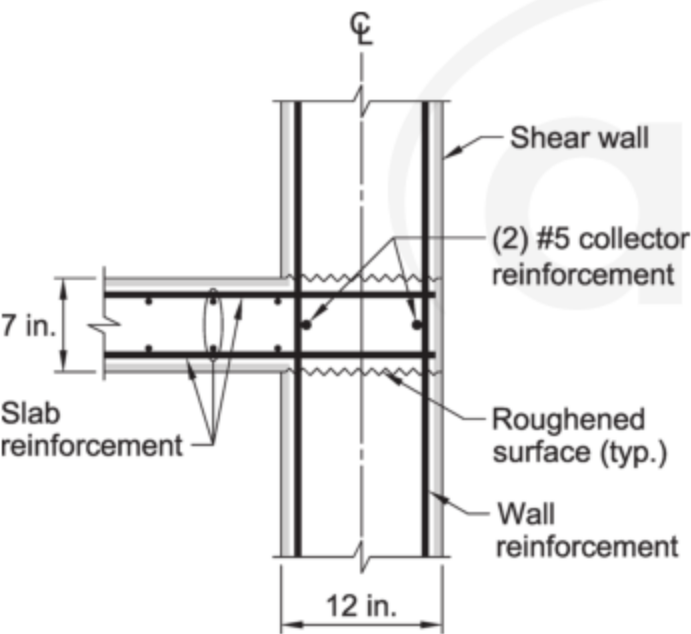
Collector reinforcement in shear walls along CL 1 and 7.
